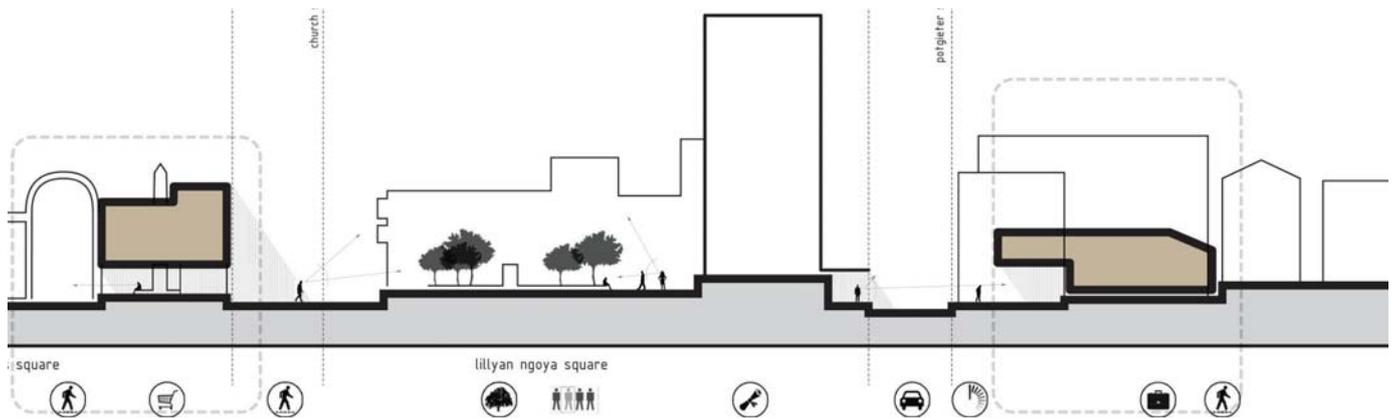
Section through Church Street and proposed development block (Author, 2011).
